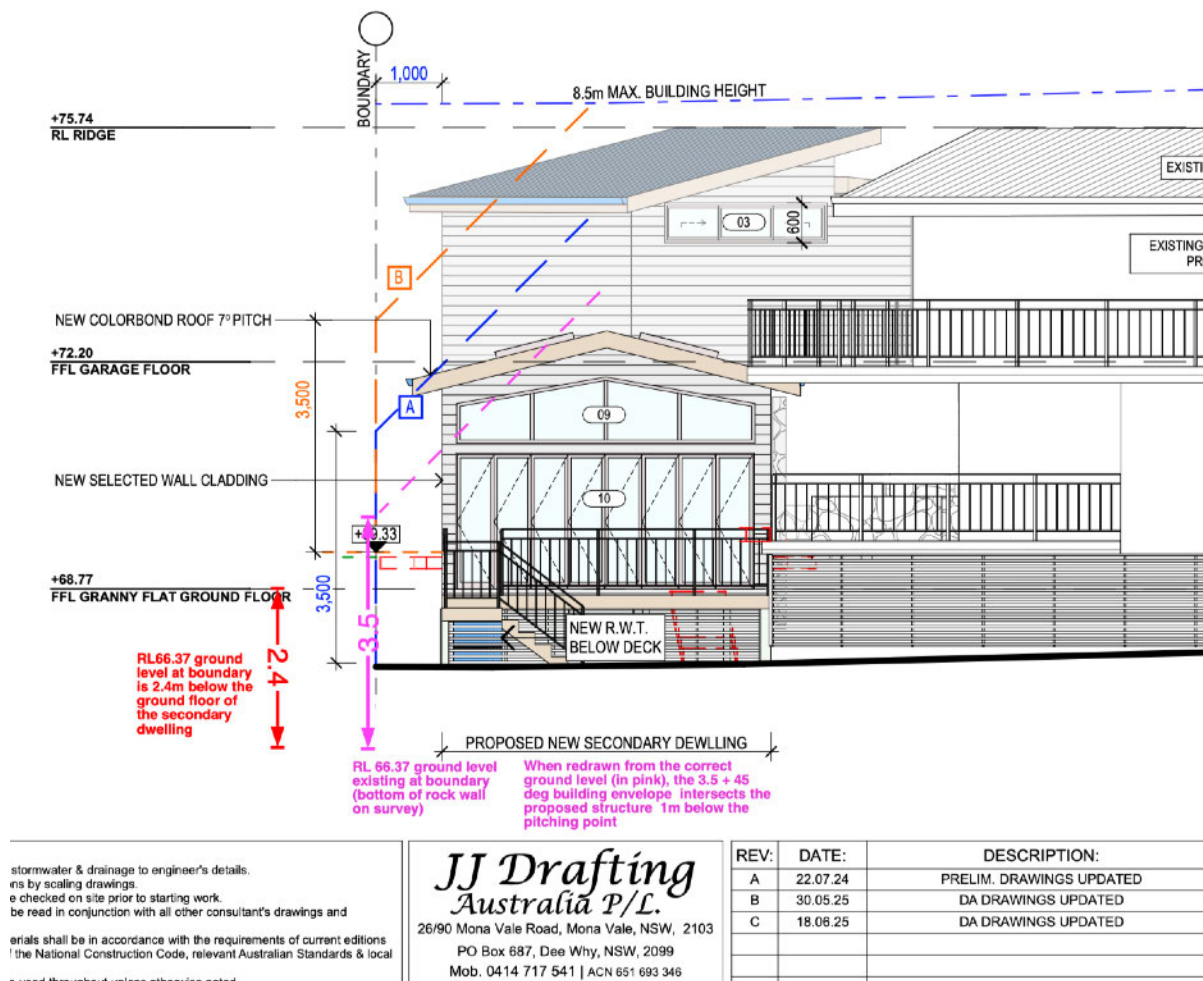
The applicants building envelope shown as measured well above the ground levels at the boundary. From RL 66.37, the envelope intersects the building 1m below the pitching point Source: JJ Drafting
